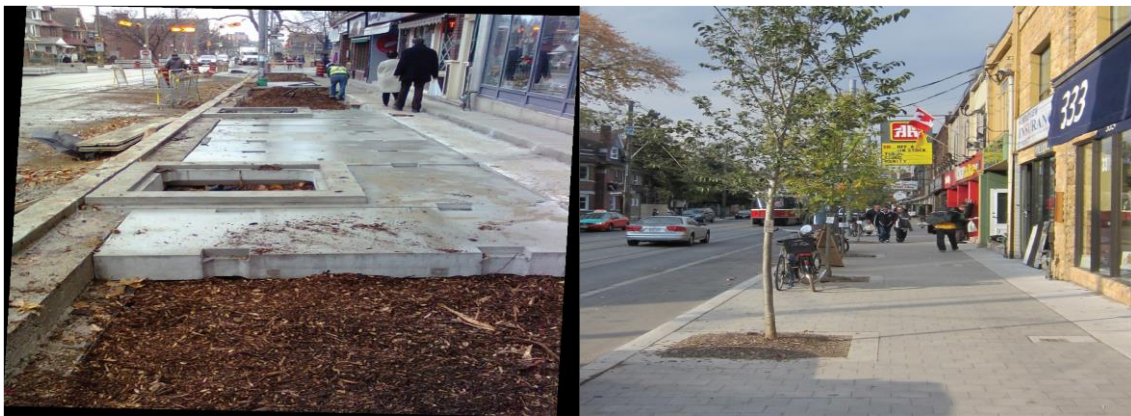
Avenue plantation in an open planting bed Source: (Olsson, 2012)
